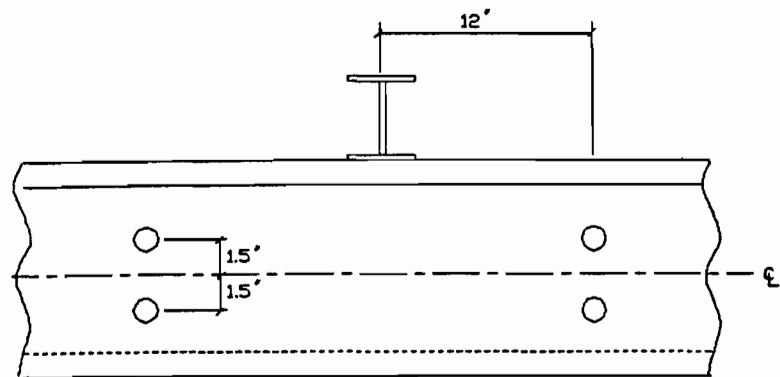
Typical Bolt Pattern for Lapped Z-Sections
